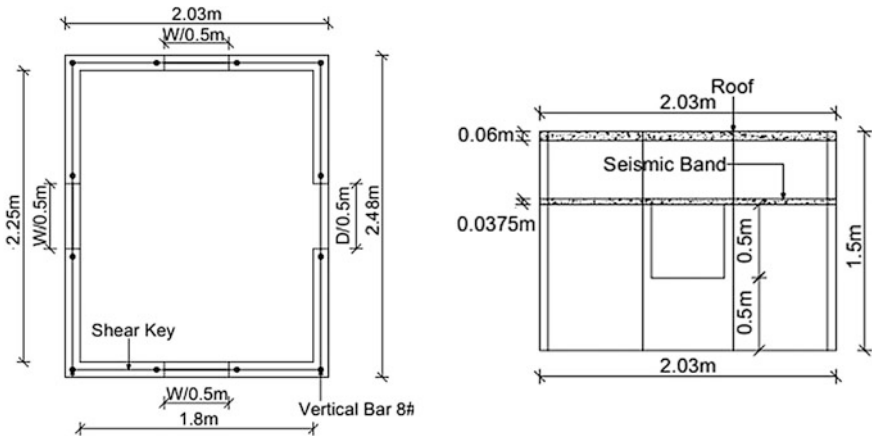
Plan and elevation of half scale earthquake resistant brick masonry model
